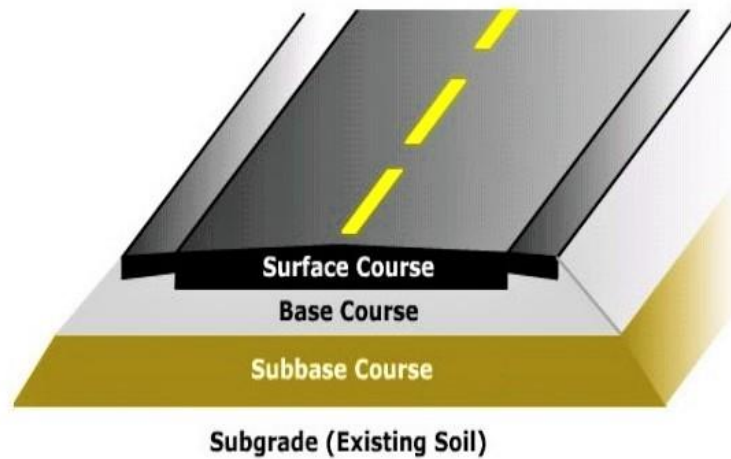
Typical Cross-Sections of Flexible Pavement
